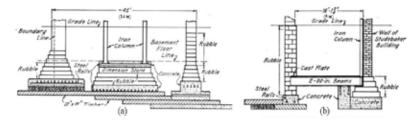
Auditorium Building, section through combined footings (a) and cantilever footing (b) (Peck, 1948).
